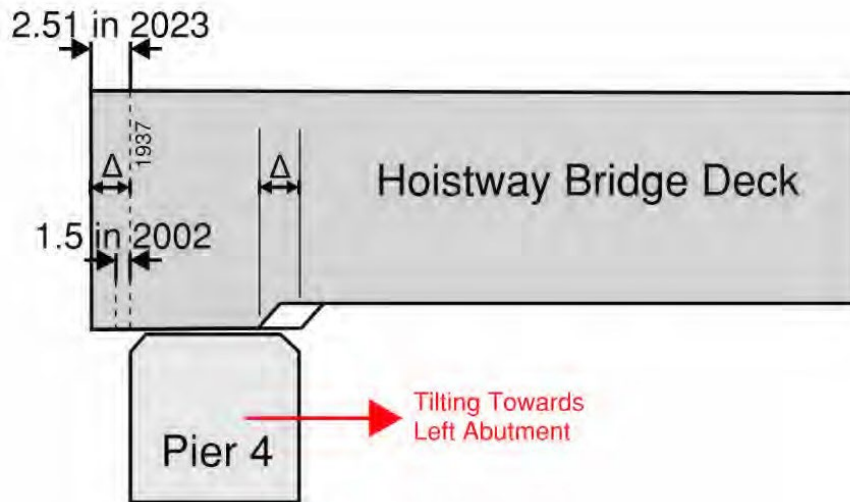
Displacement at the Pier 4 – Hoistway Bridge Junction per 2002 and 2023 Surveys (looking upstream)
